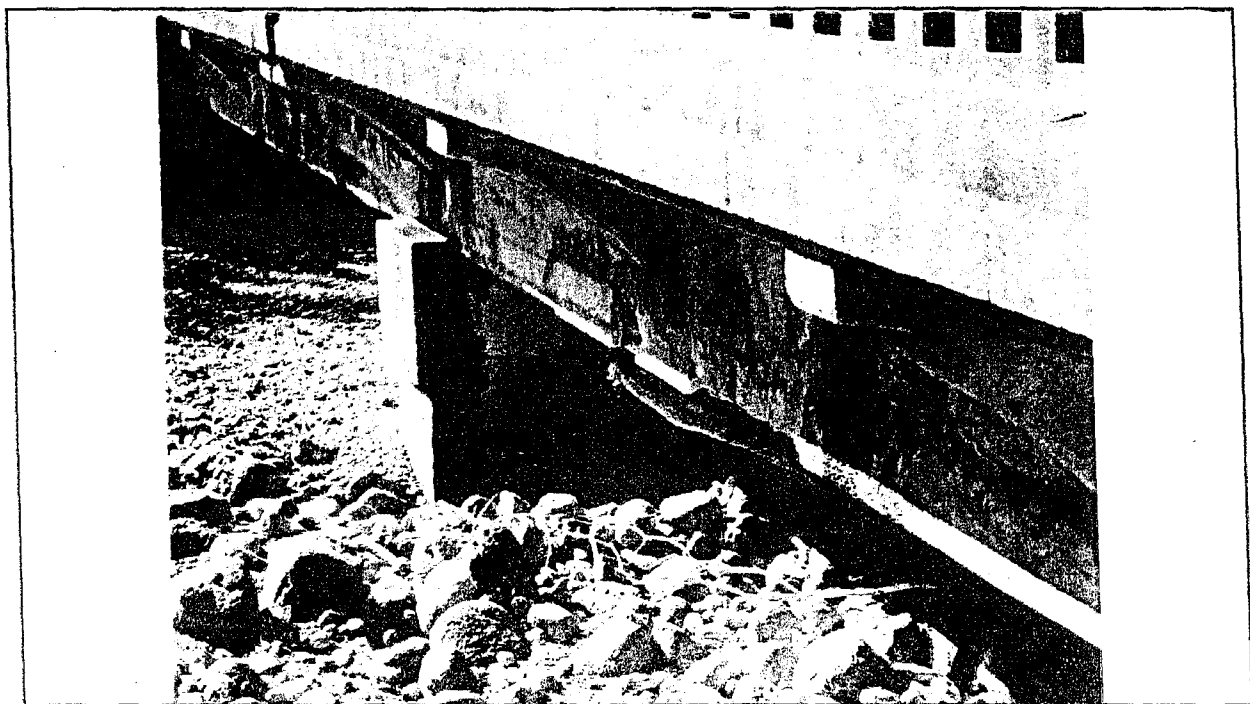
Photo of Kaipapa`u Bridge, Makai Side, Showing Structural Damage, Taken to South/Southwest.
